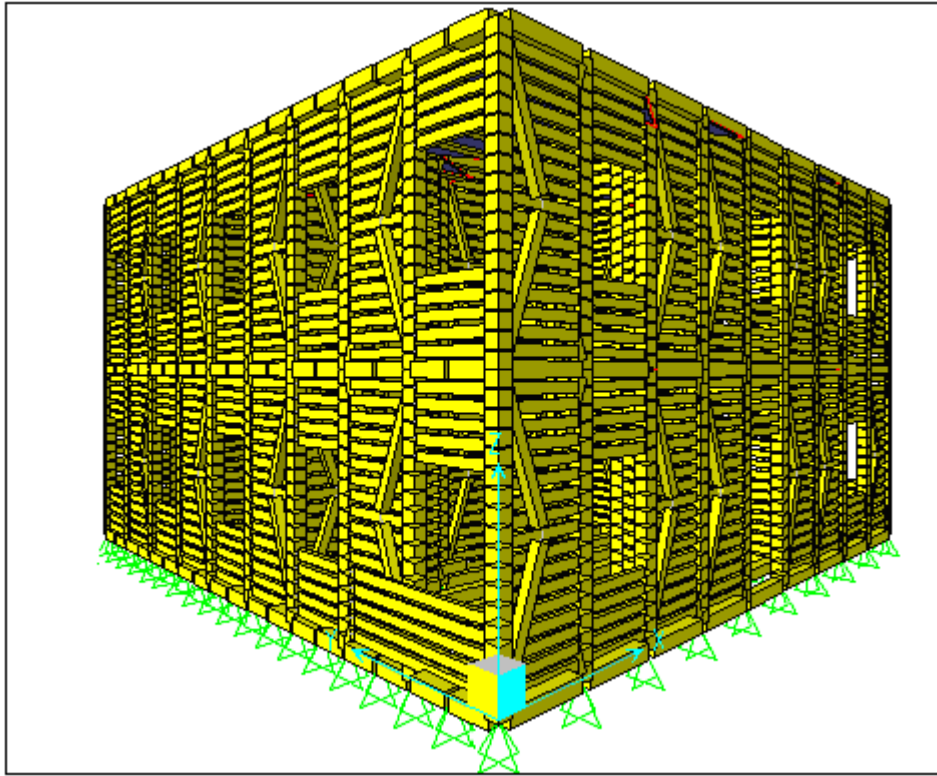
Undeformed Shape of Bagdadi Type Building Without Infill
